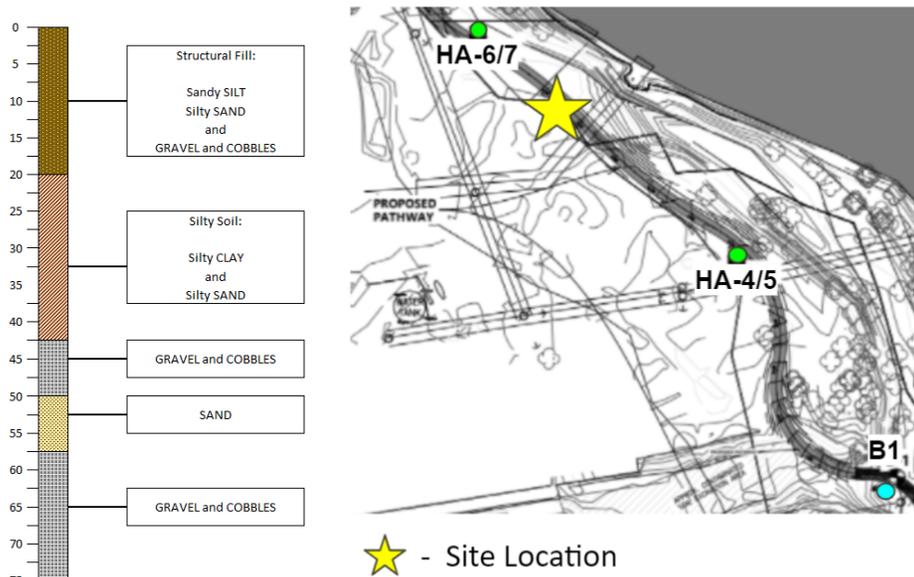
Current site condition soil conditions groundwork for geotechnical design
